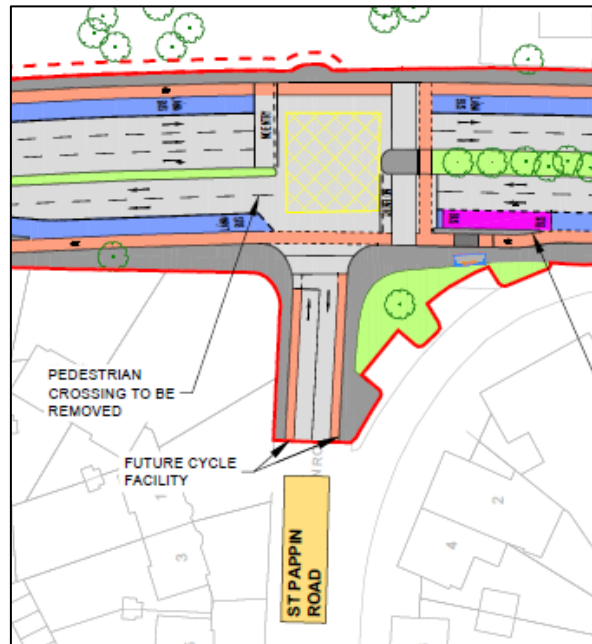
Proposed Junction Layout at St. Pappin Road
